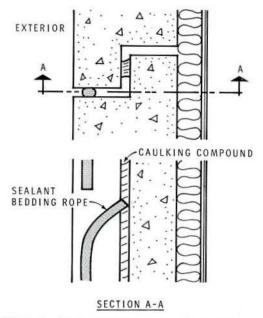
Vertical joint between concrete wall panels. Note: Although rain penetration can be controlled in the joints, the use of this wall design is not recommended (CBD's 93 and 94).
